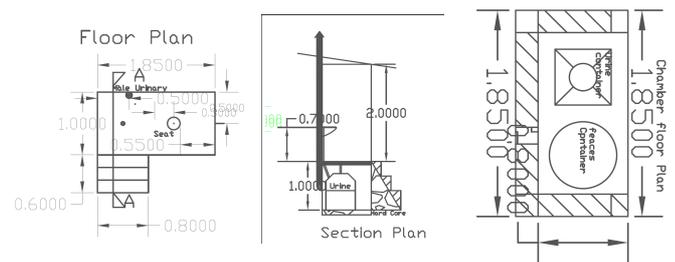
the floor and section plan for Agafari's UDDT (source: ROSA Arba Minch; 2009)
